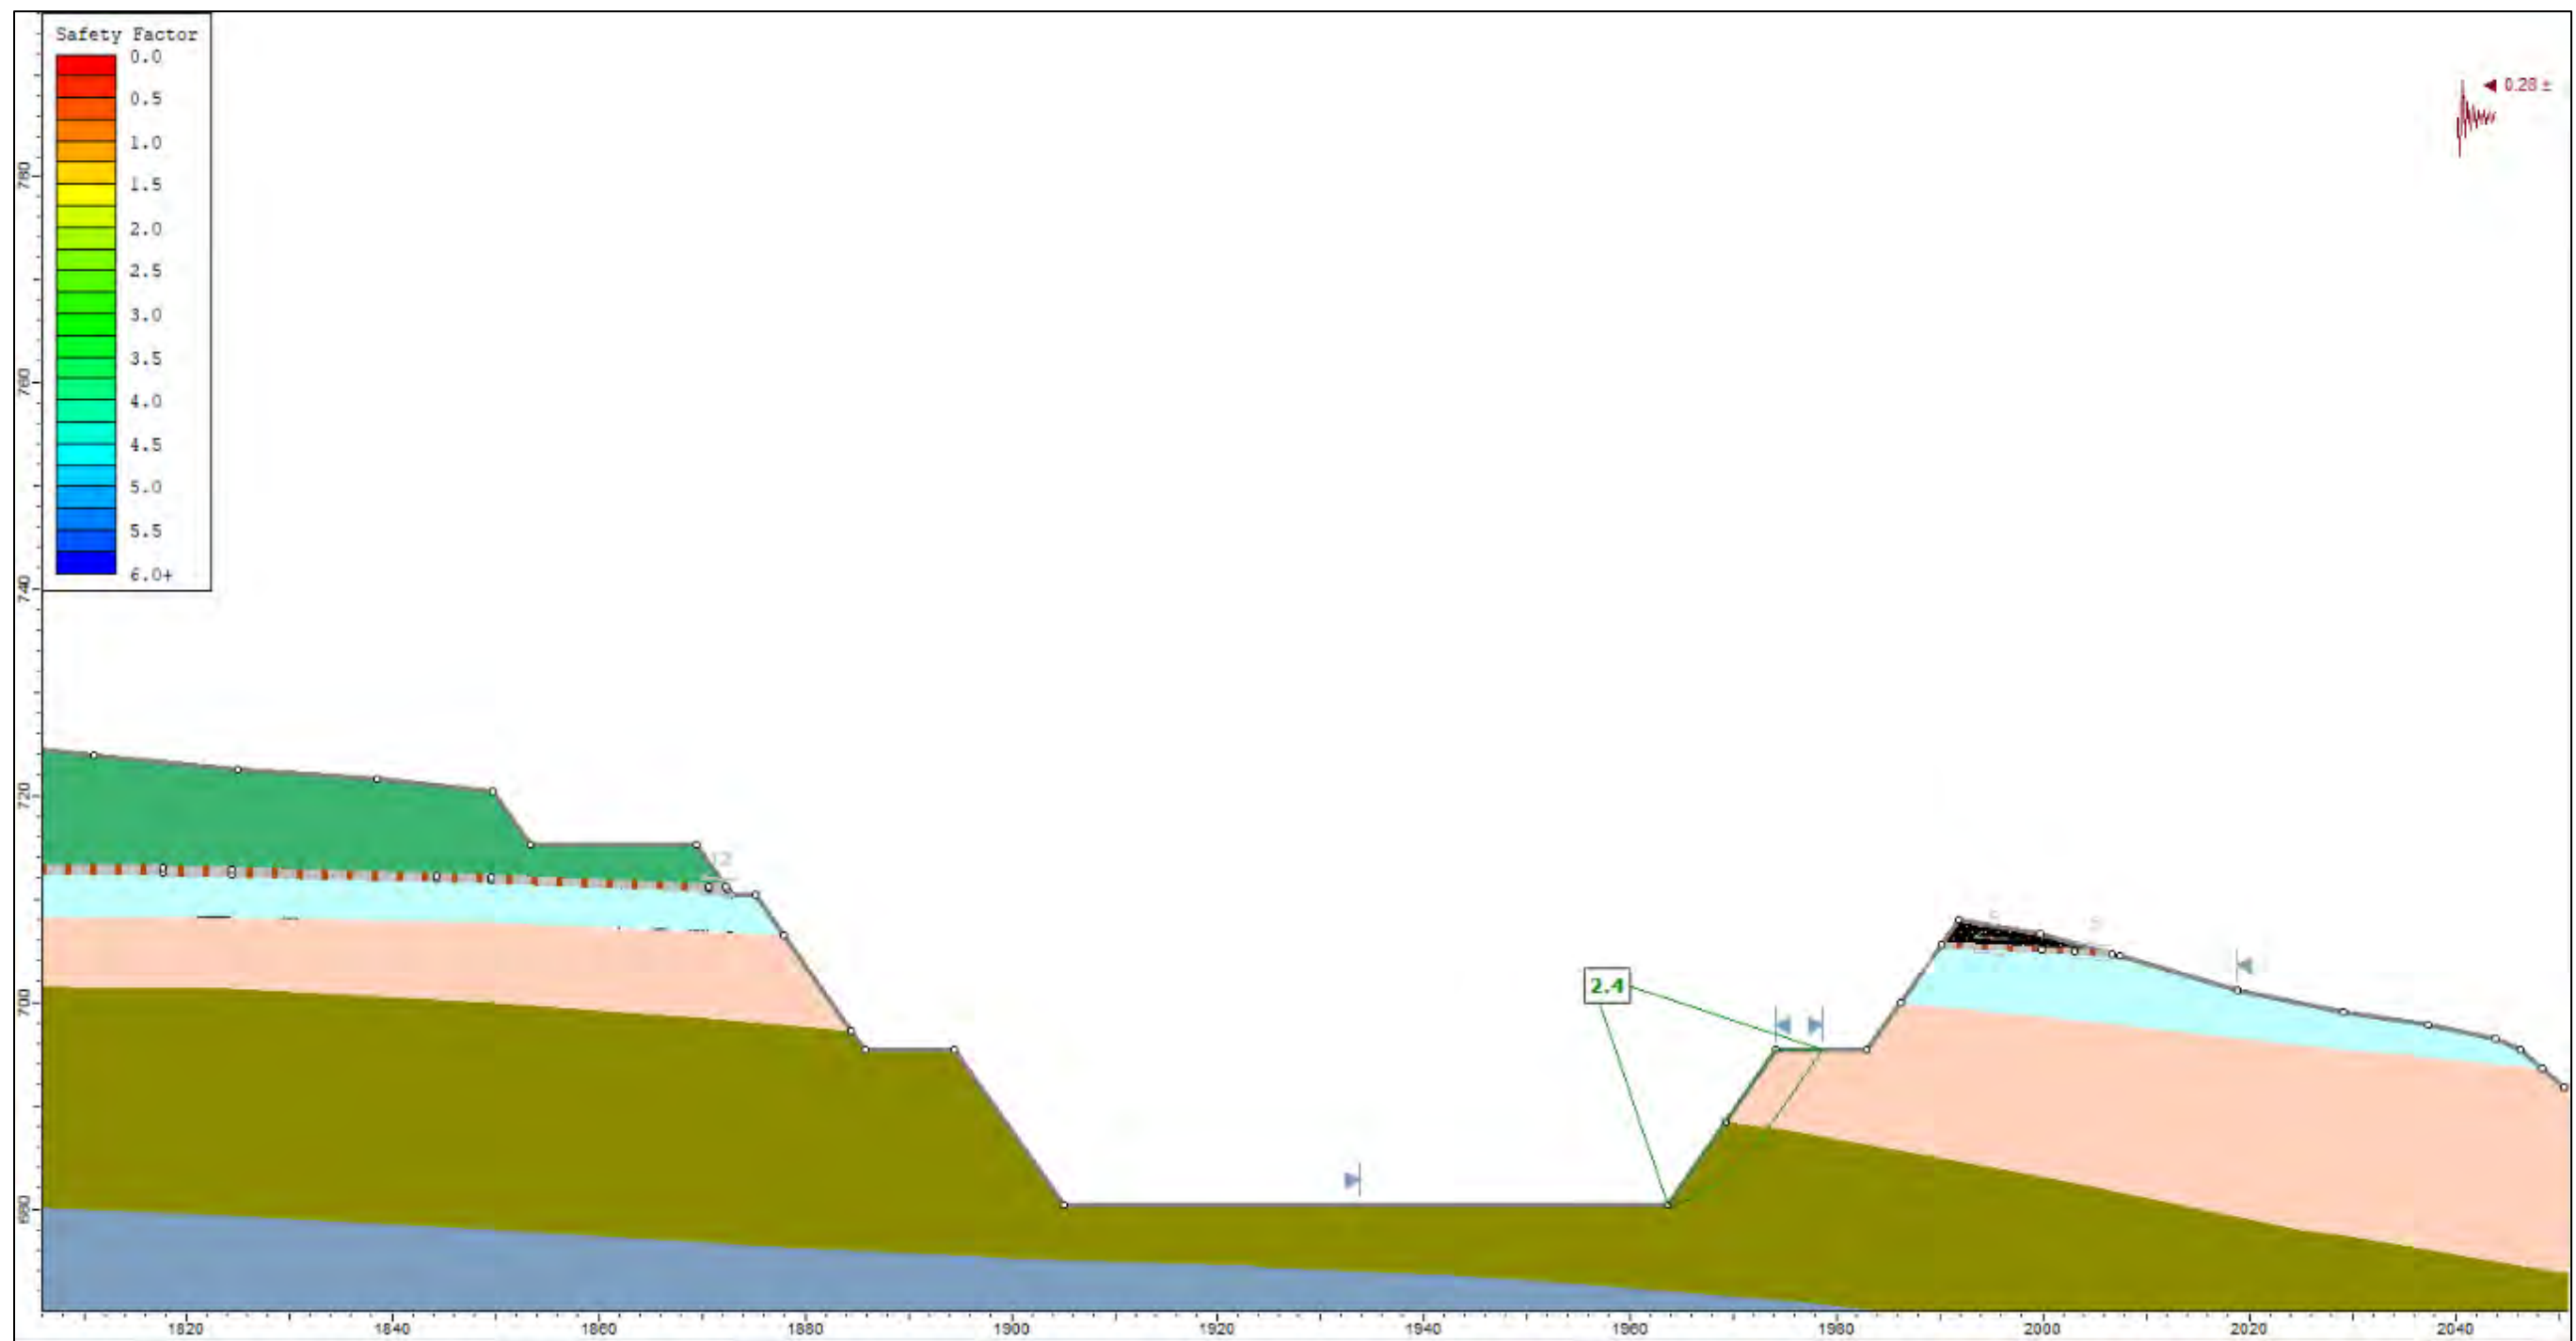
Slope Stability Analysis of West Sump Highwall (South wall) – Section 101 – SLS Conditions.
